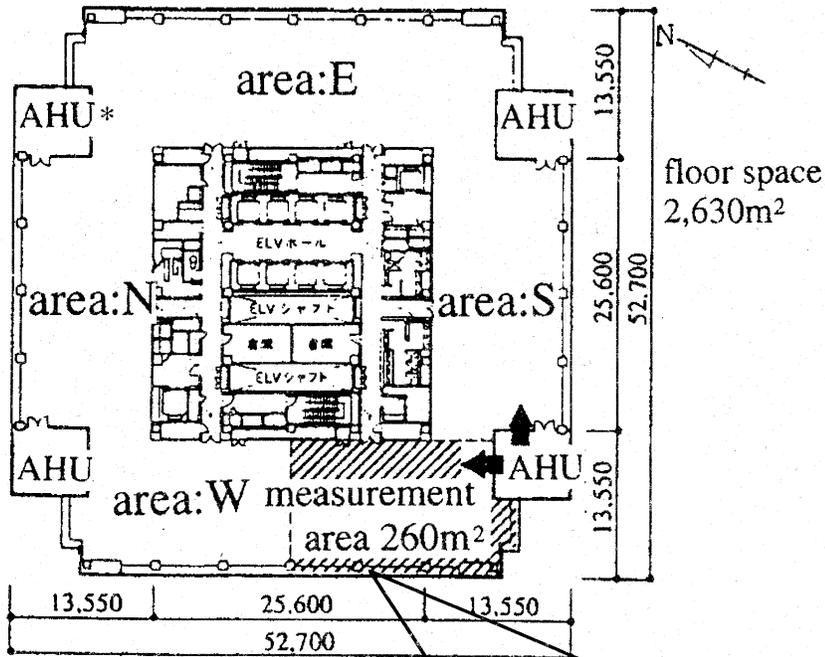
Floor plan and measured areas with floor outlet layout (plan) on the underfloor air-conditioning floor and vertical temperature measurement points (*AHU is air-handling unit).
